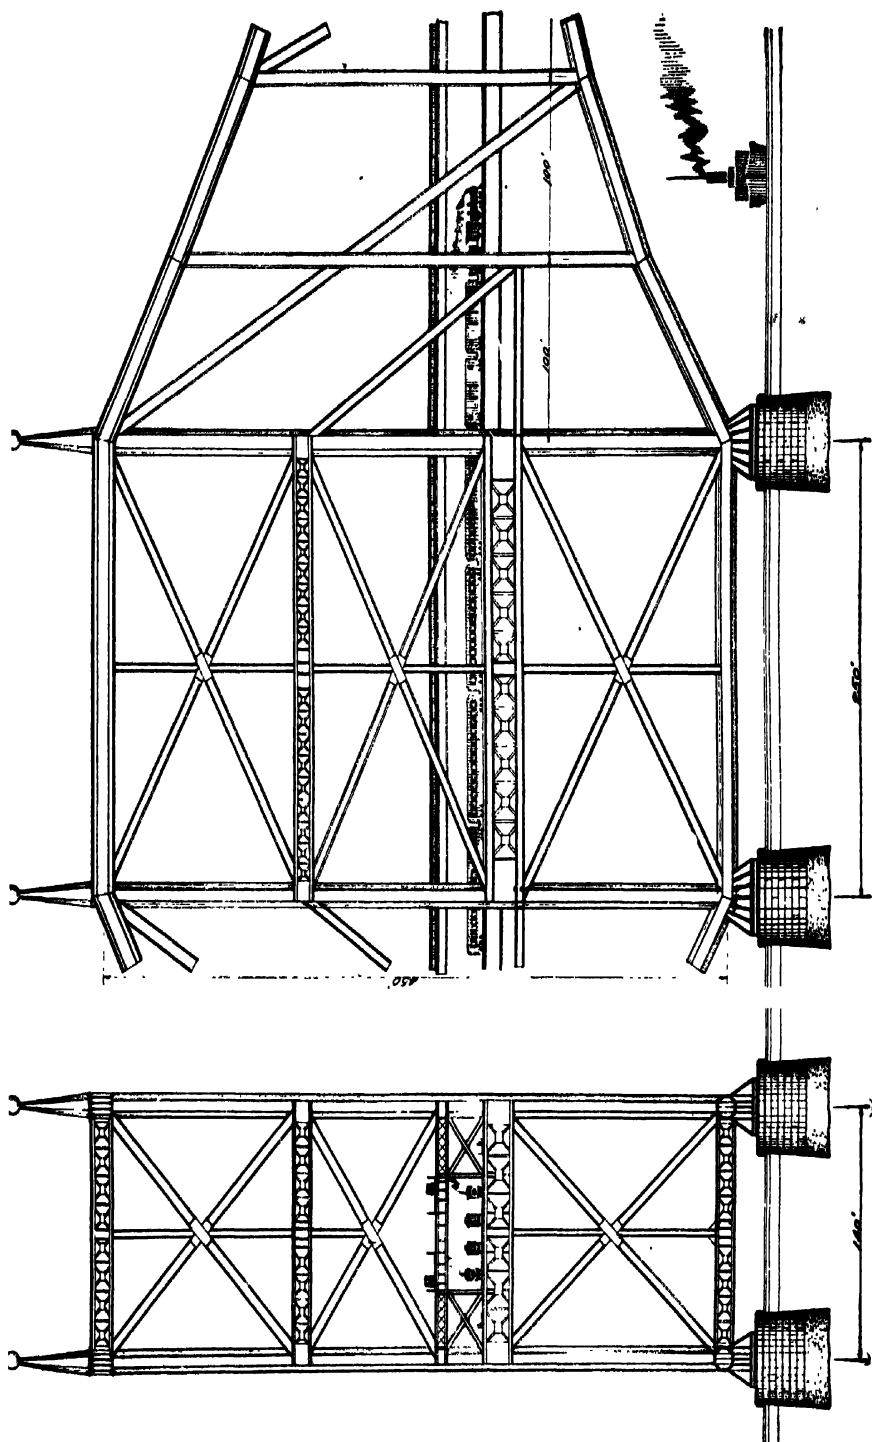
f. Side and End Elevation of Piers and Towers of Proposed Cantilever Bridge over San Francisco Bay.
